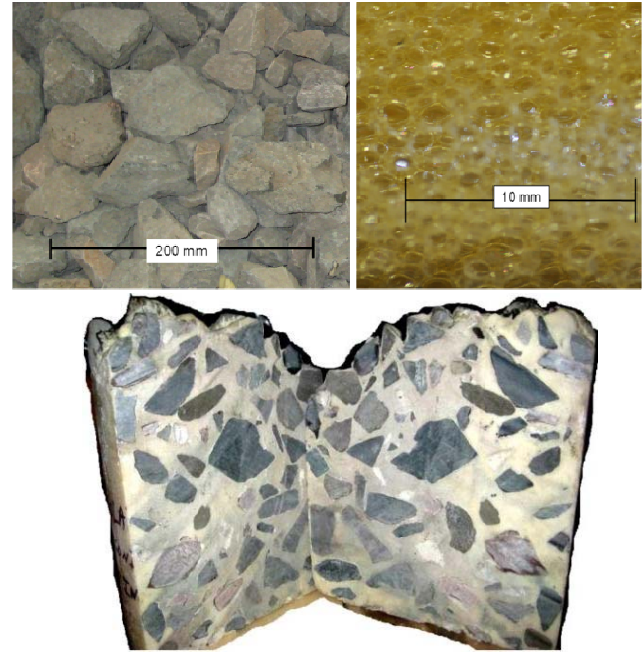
Pictures of granitic ballast (top-left), RPF foam (top-right), and PSB specimen cut in half with concrete masonry saw (bottom)
